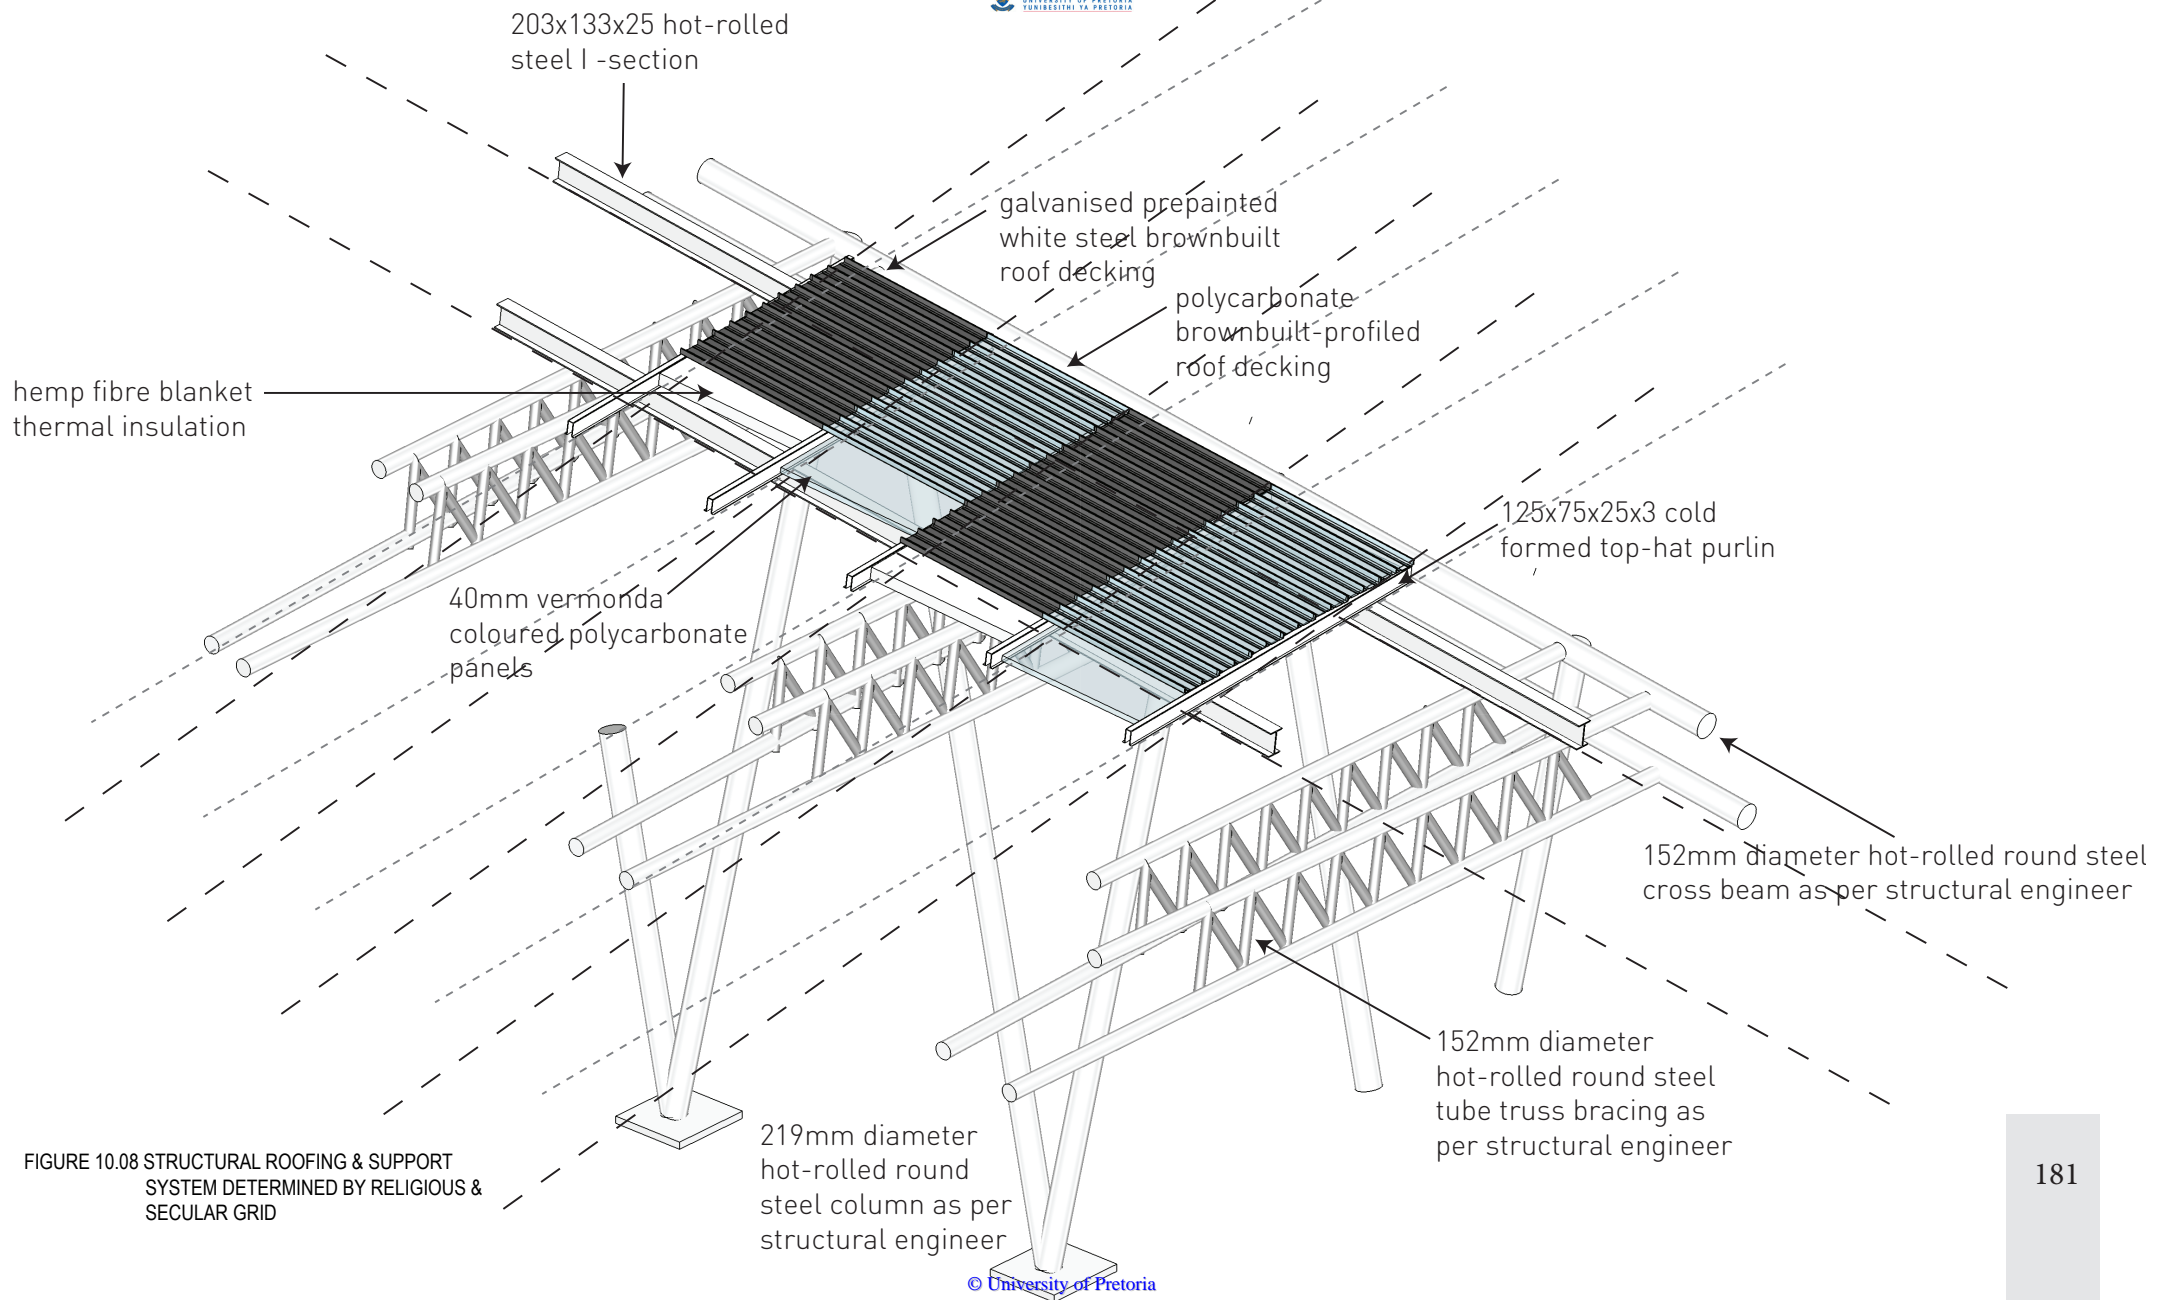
STRUCTURAL ROOFING & SUPPORT SYSTEM DETERMINED BY RELIGIOUS & SECULAR GRID
